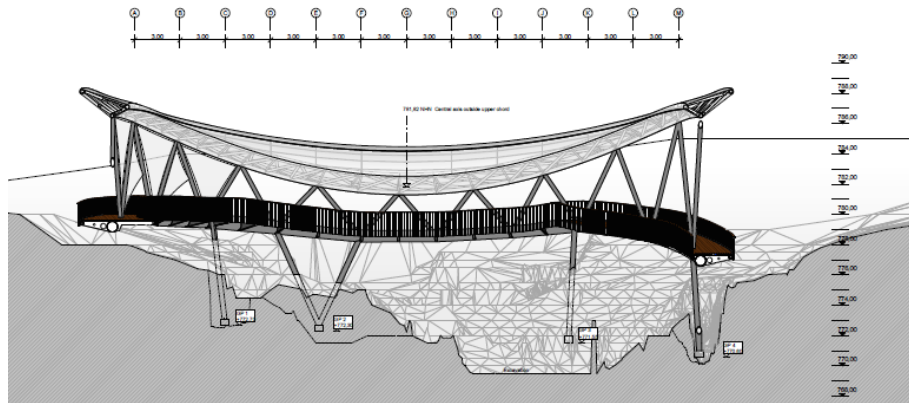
Longitudinal cross-section of the roof structure (Arge, 2014).
